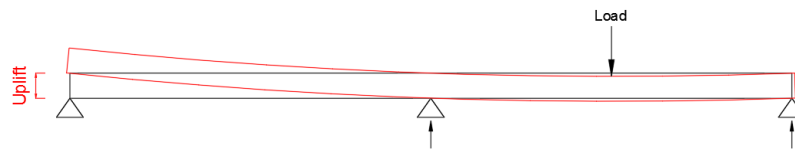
Deflection diagram of centre bearing swing bridge (not to scale)
